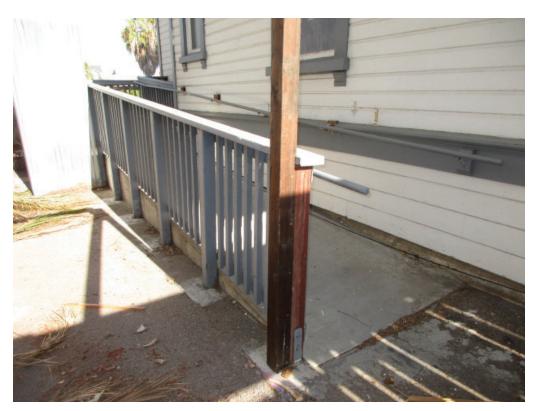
Looking northwest at the accessibility ramp located at the south facade. The ramp is a combination of cast-in-place concrete and OSB wood boards.
